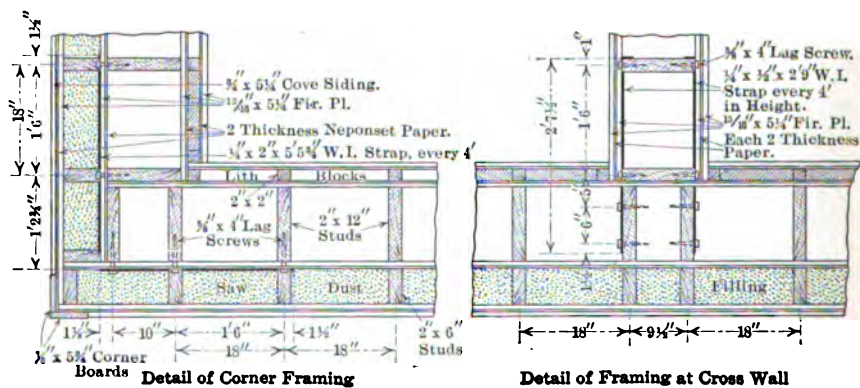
Wall details, icing plant, Hawthorne—Chicago, Burlington & Quincy.
